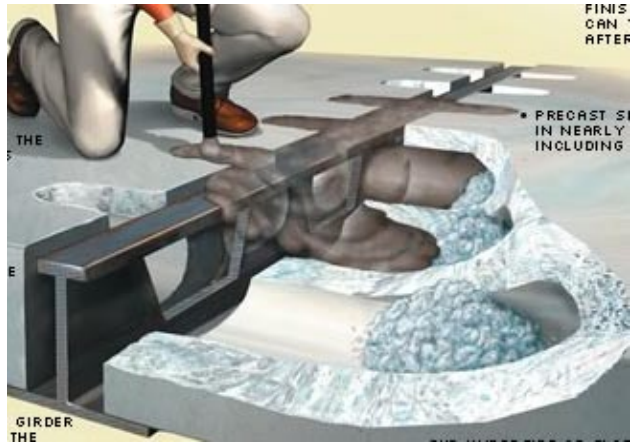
Girder-Slab Detail courtesy of Girder-Slab® Technologies
